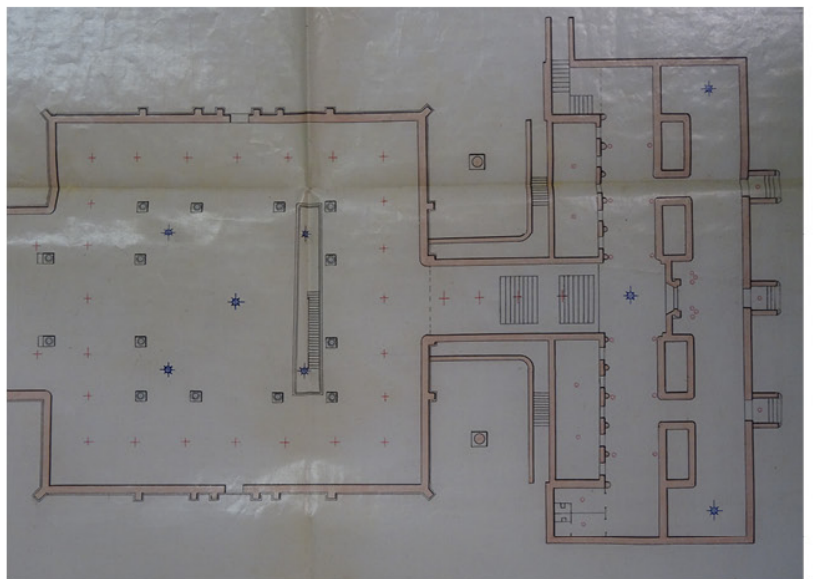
Plan of the electrical installations, 1891, detail of the Embarcadère and Serre du Congo
